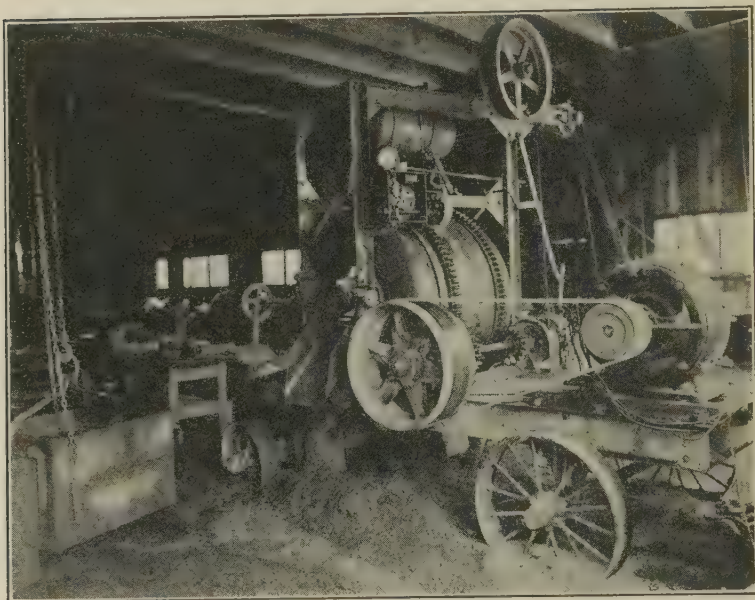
VIEW OF CONCRETE MIXER USED IN TESTS.
